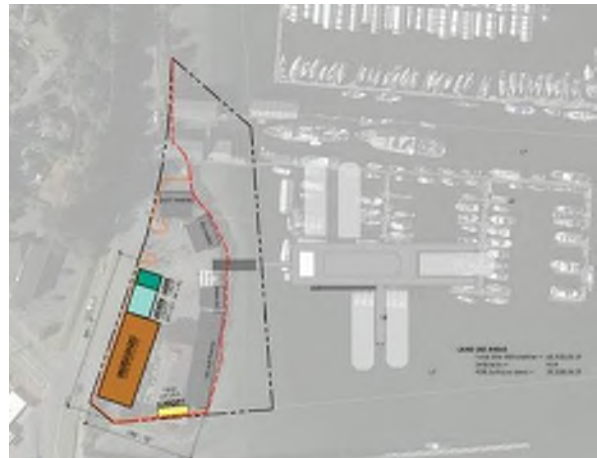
Conceptual Site Layout for Port Orchard Railway Marina and Bar & Grill Properties
